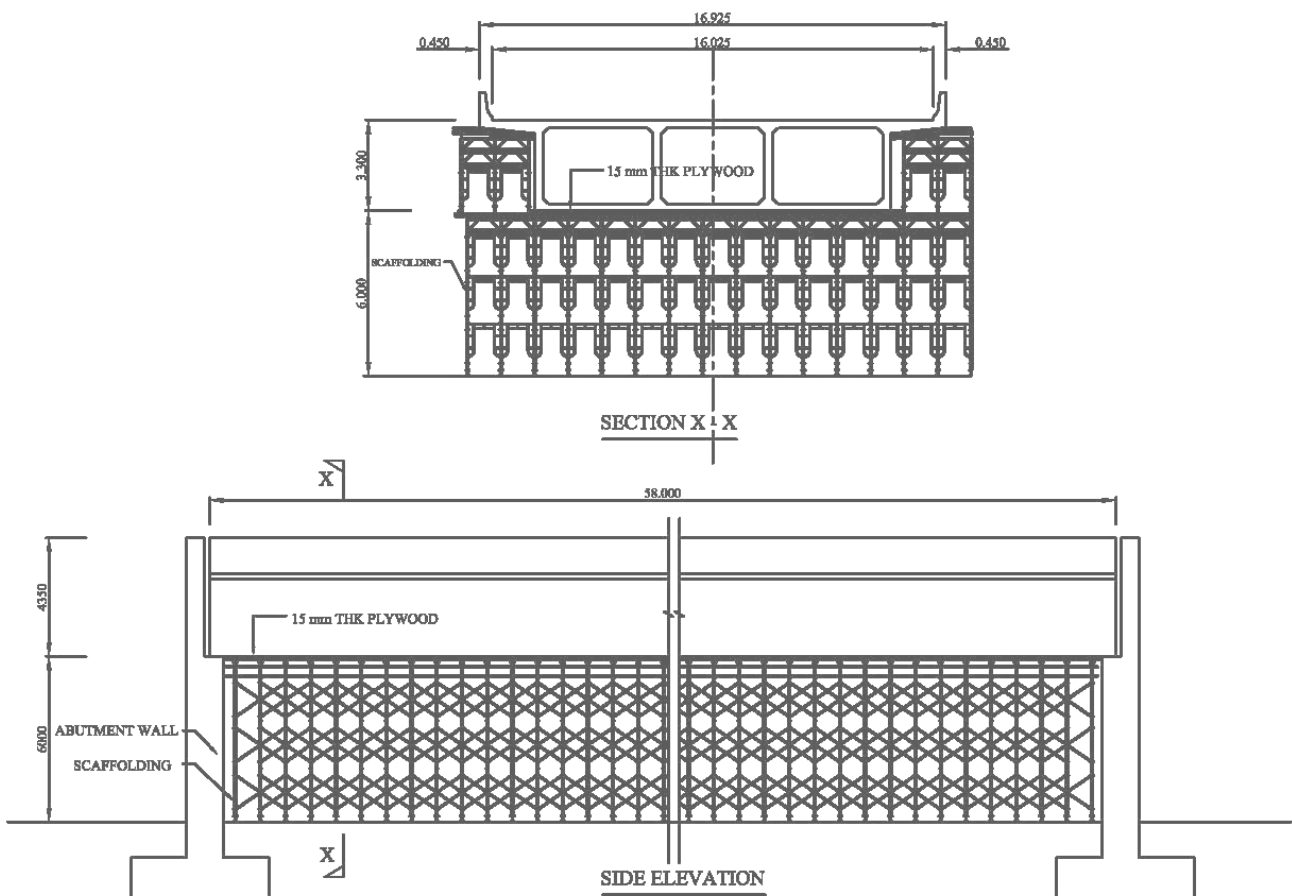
Scaffolding System for Post-tensioned PC Box Girder
